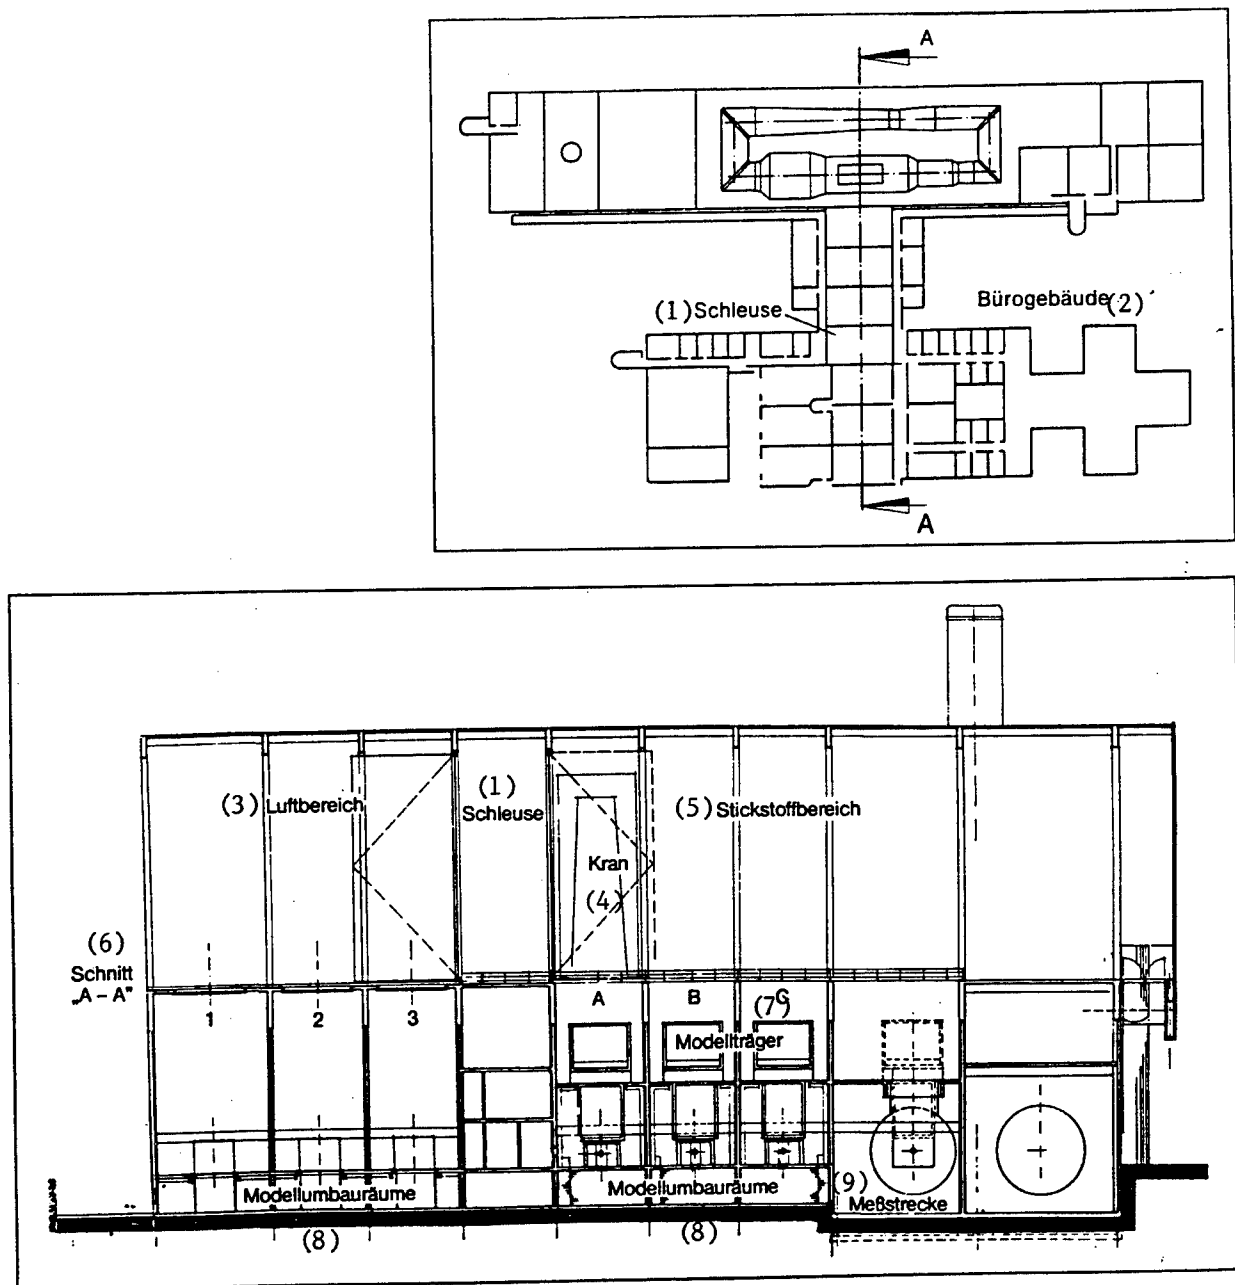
Building Cross-Section and Layout of Entire ETW Facility
